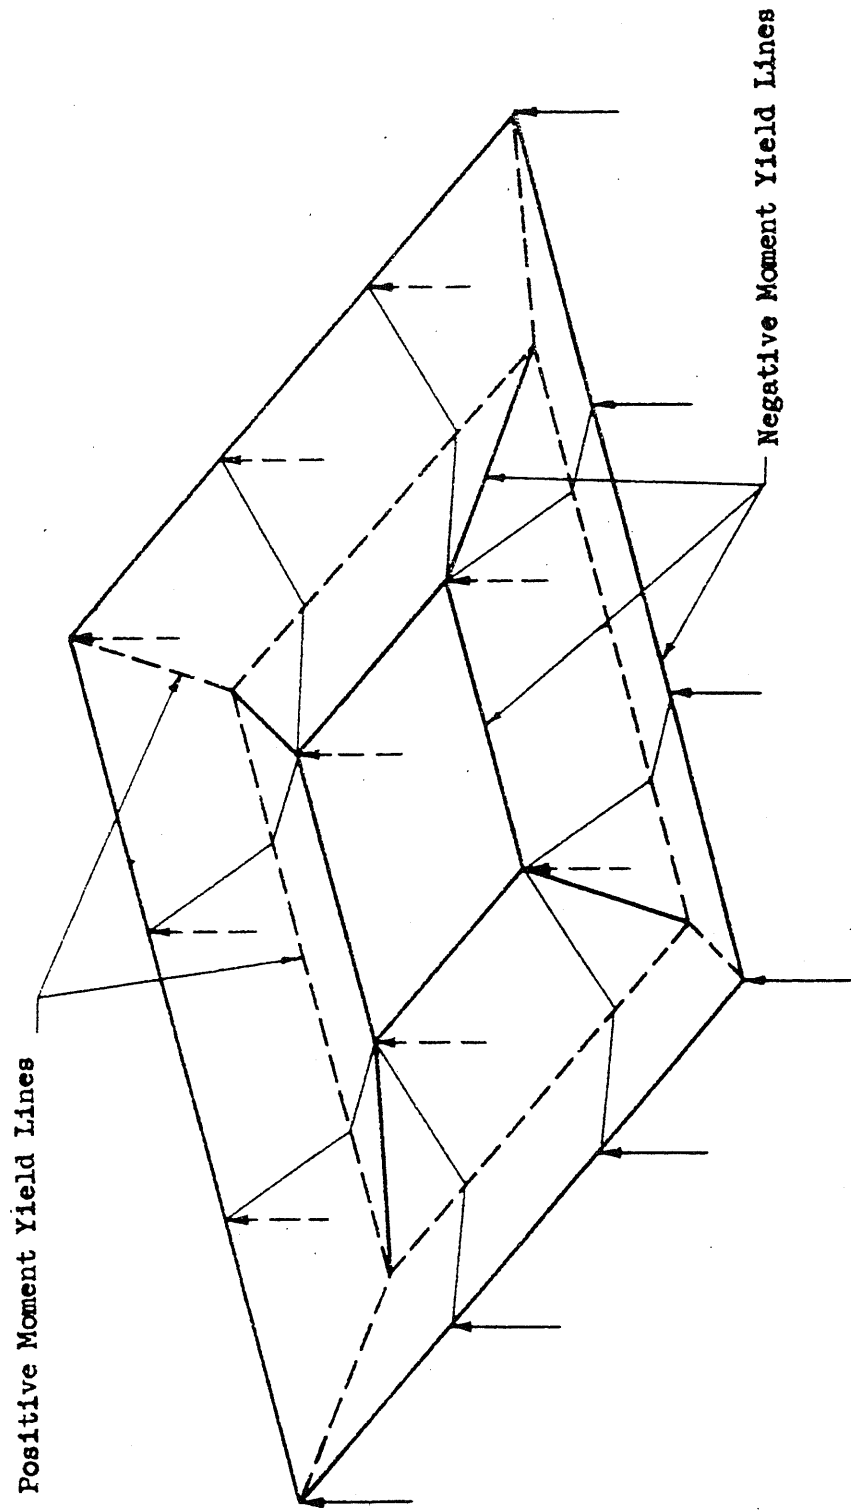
"SLAB FAILURE" MECHANISM OF THE EXTERIOR SPANS
